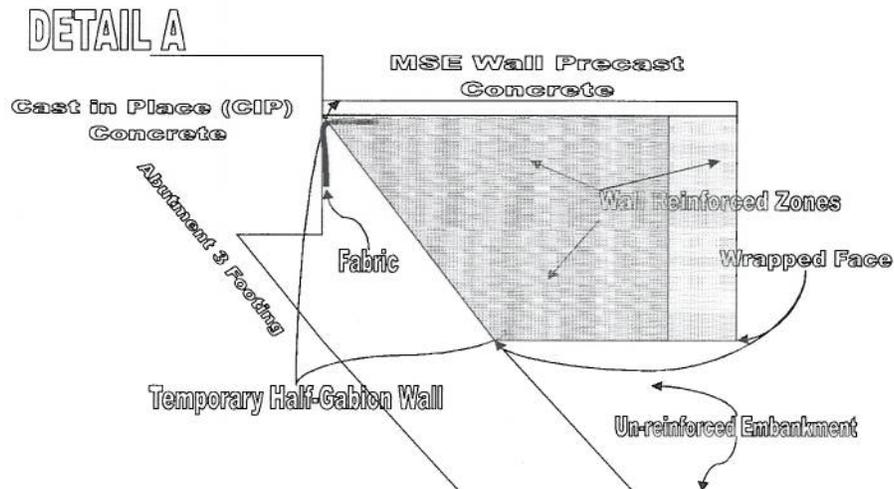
(b): Details of half gabion and MSE walls showing limits of the east face.
